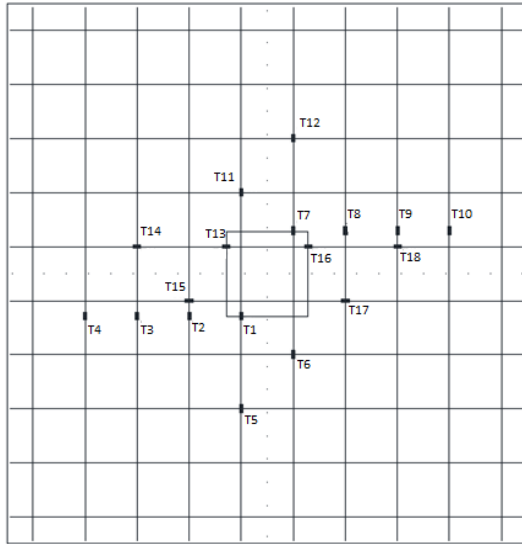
Tension reinforcement strain gage layout for 0.64% reinforcement ratio
